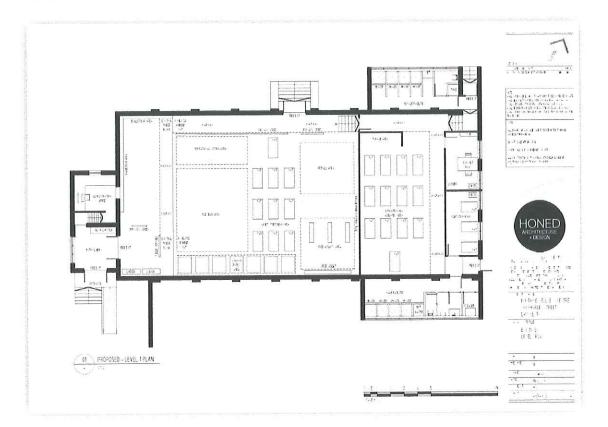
Boutique Wellness Centre (BWC) Potters House floor plan.
